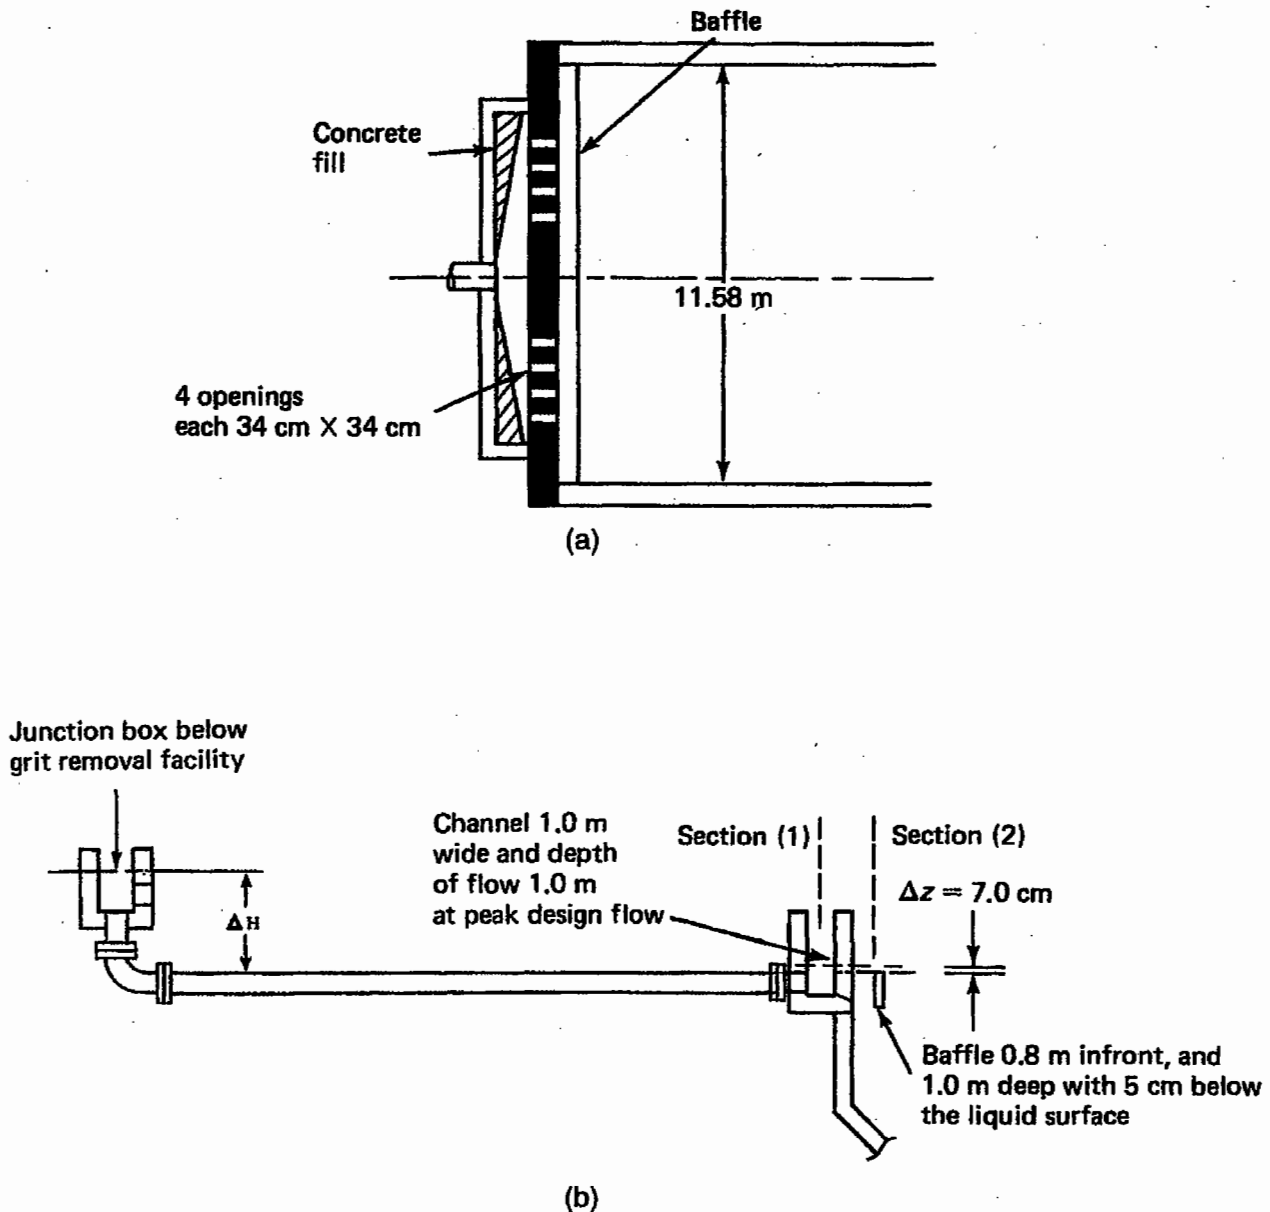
Example of Influent Structure and Piping Details: (a) plan of influent structure and (b) connecting pipes from junction box below the grit removal facility to the influent structure of the sedimentation basin.
